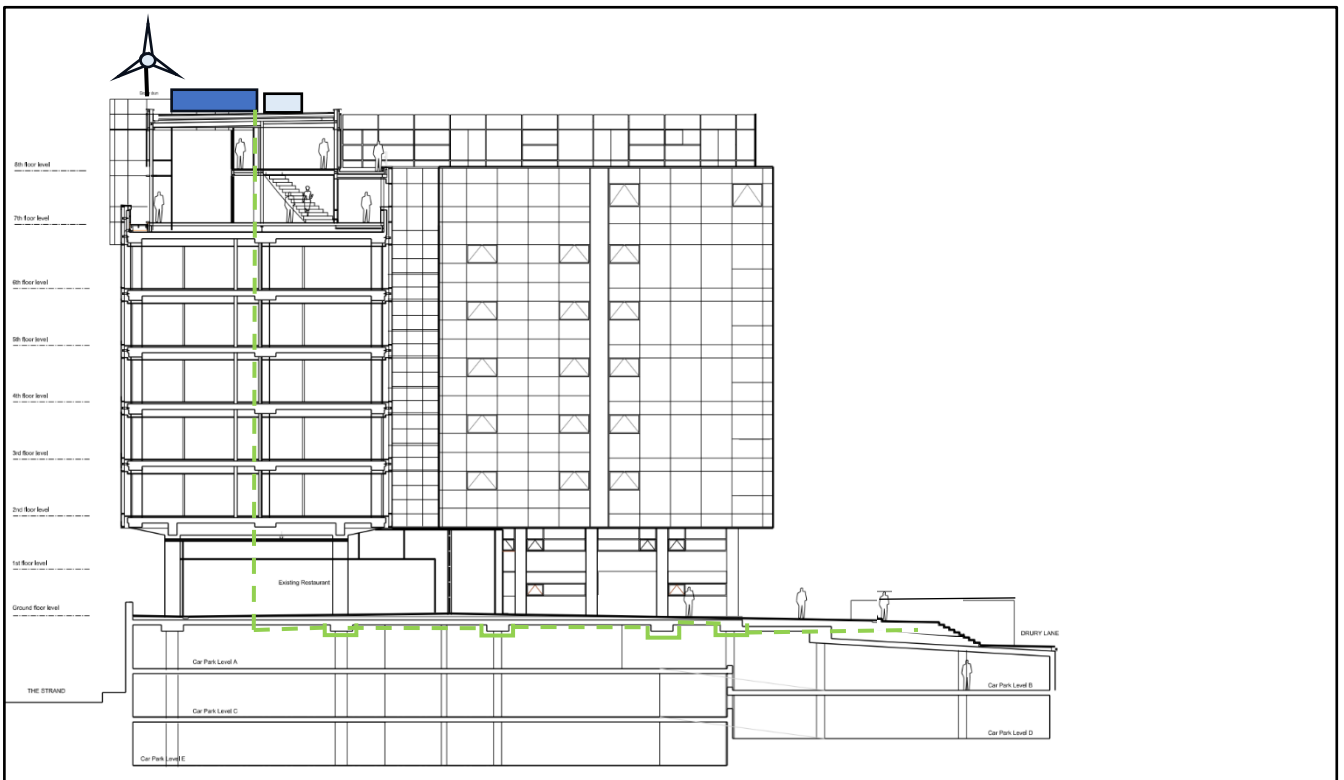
Section through Beetham Plaza and the piazza showing renewables and possible wiring line
